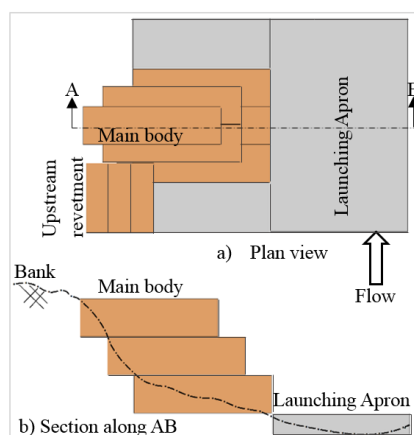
Layout plan and section of groynes implemented in study channel (Figure not to scale)
